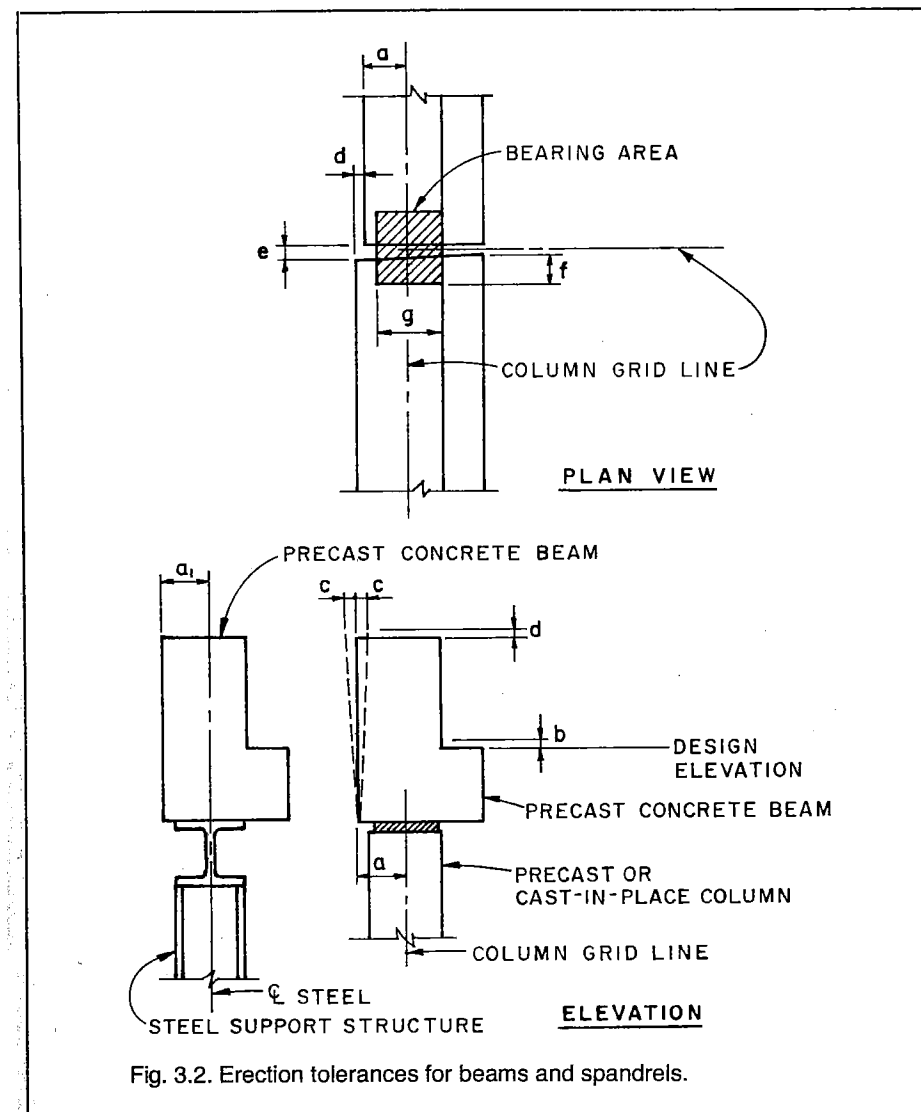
Erection tolerances for beams and spandrels.
